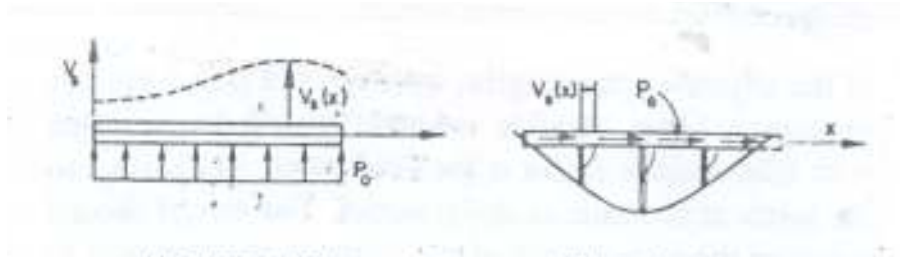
Bridge Deck Subjected to Assumed Transverse and Longitudinal Loading
